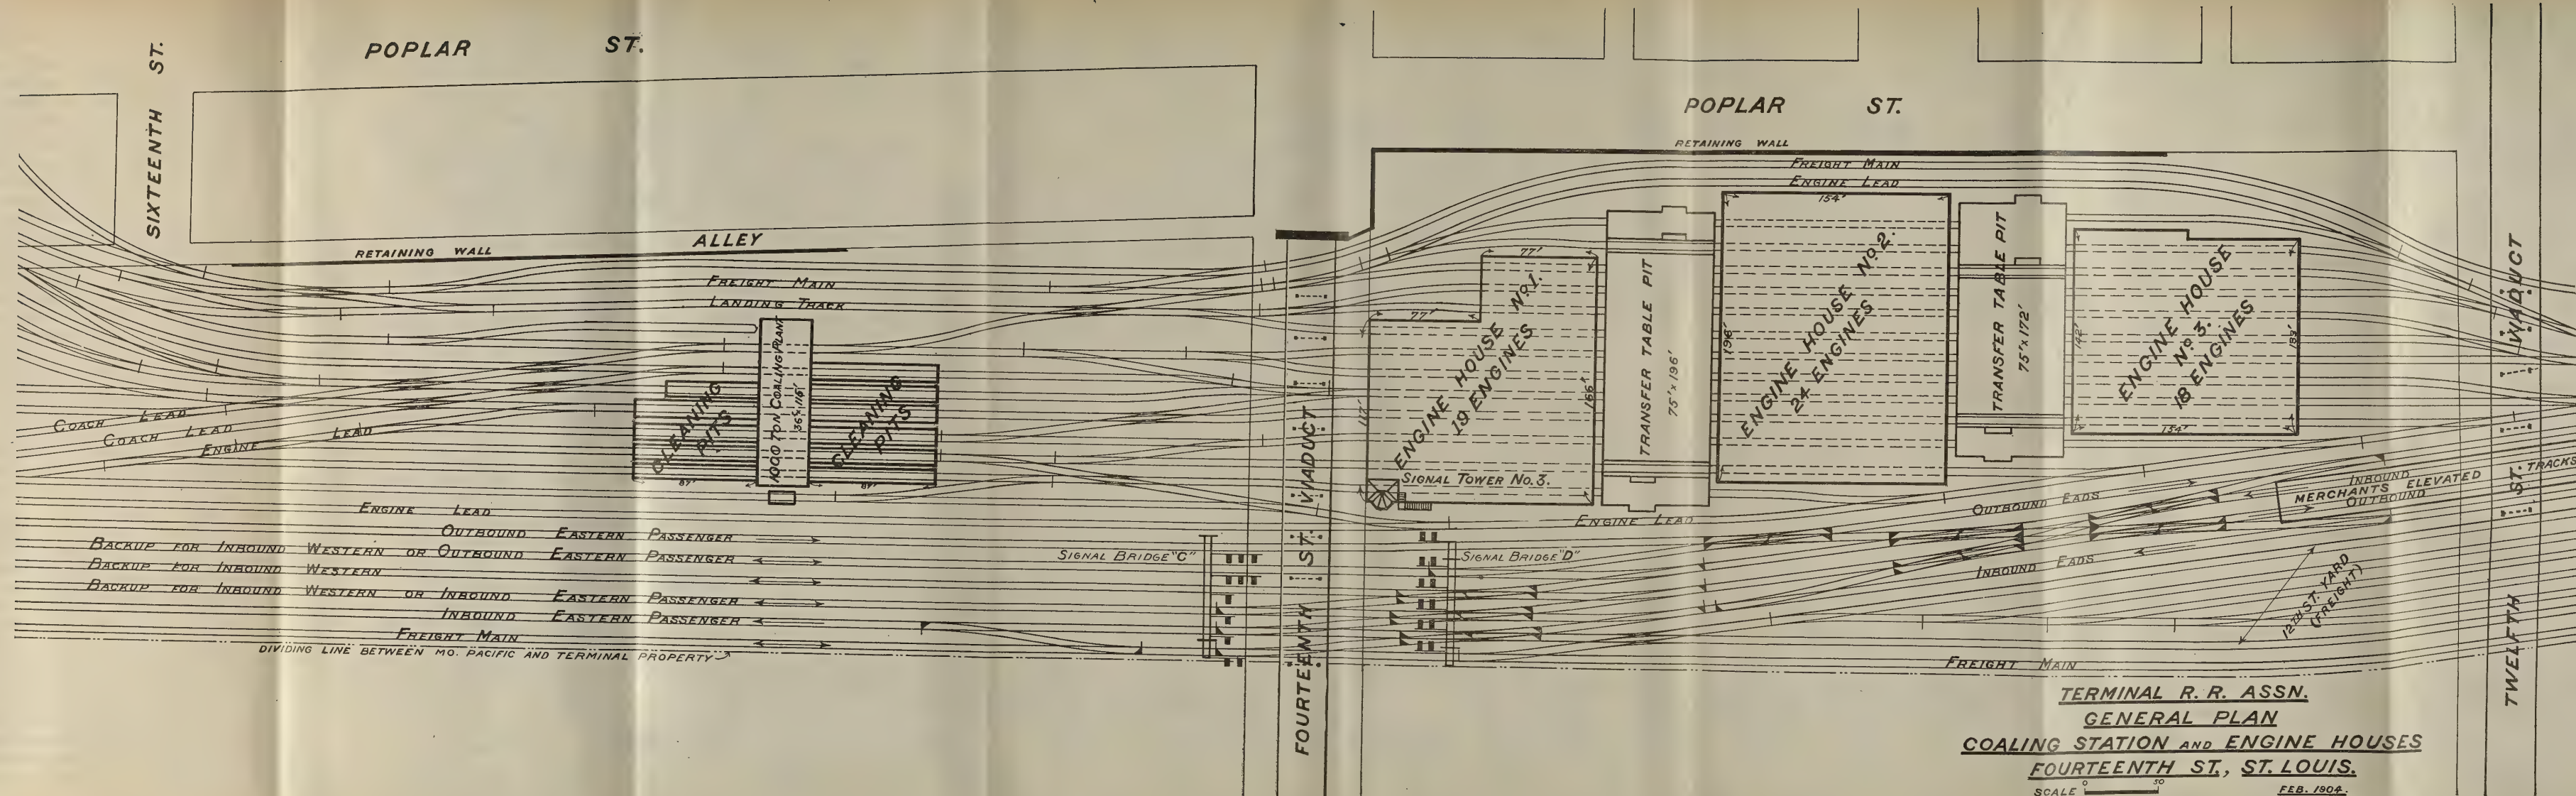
GENERAL PLAN OF FACILITIES FOR HANDLING LOCOMOTIVES IN CONNECTION WITH UNION STATION.
